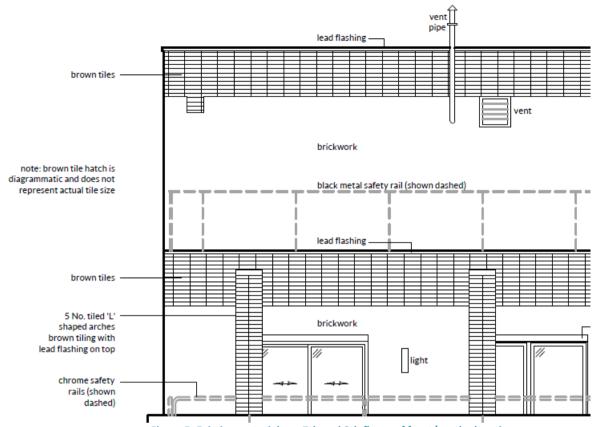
Existing materials on 7th and 8th floors of front/north elevation
